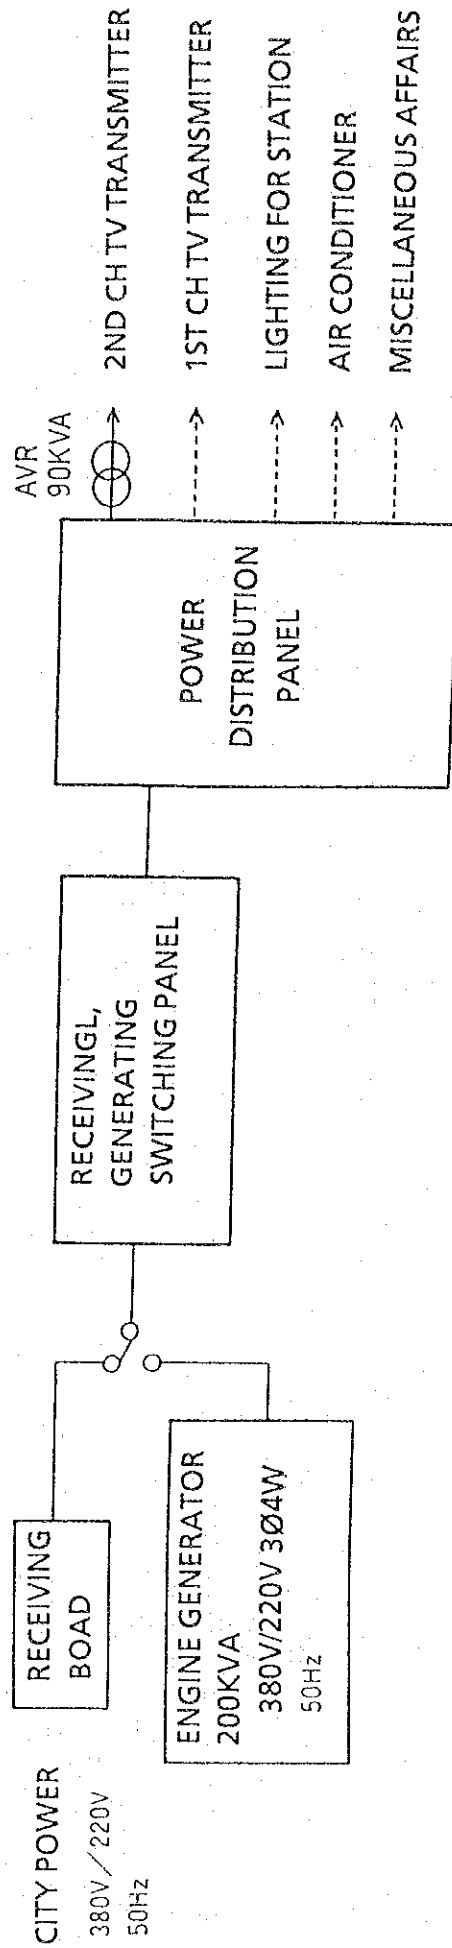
SEQUENCE DIAGRAM OF ELECTRICAL INSTALLATION OF NEW HASSAKE STATION
